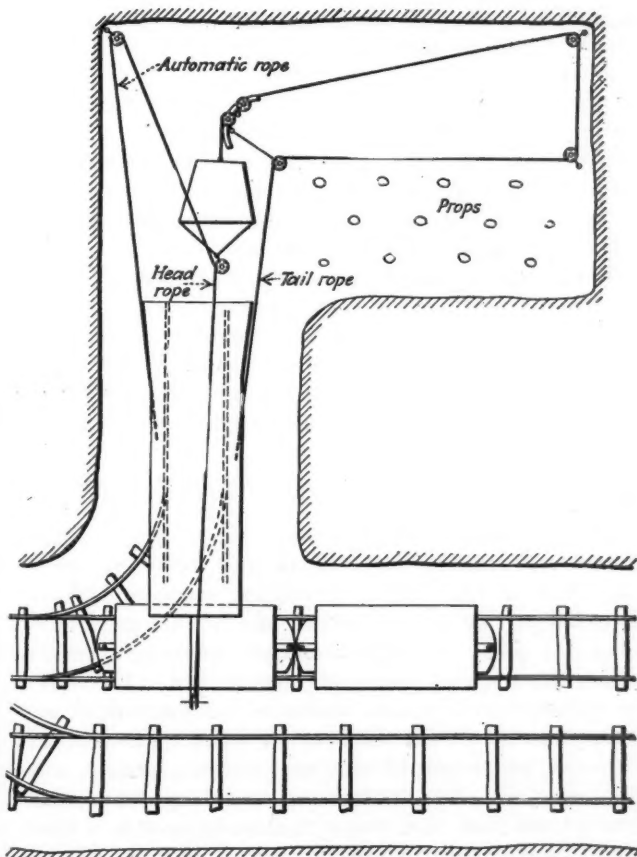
Plan Proposed for Advancing Rooms in No. 8 Mine
